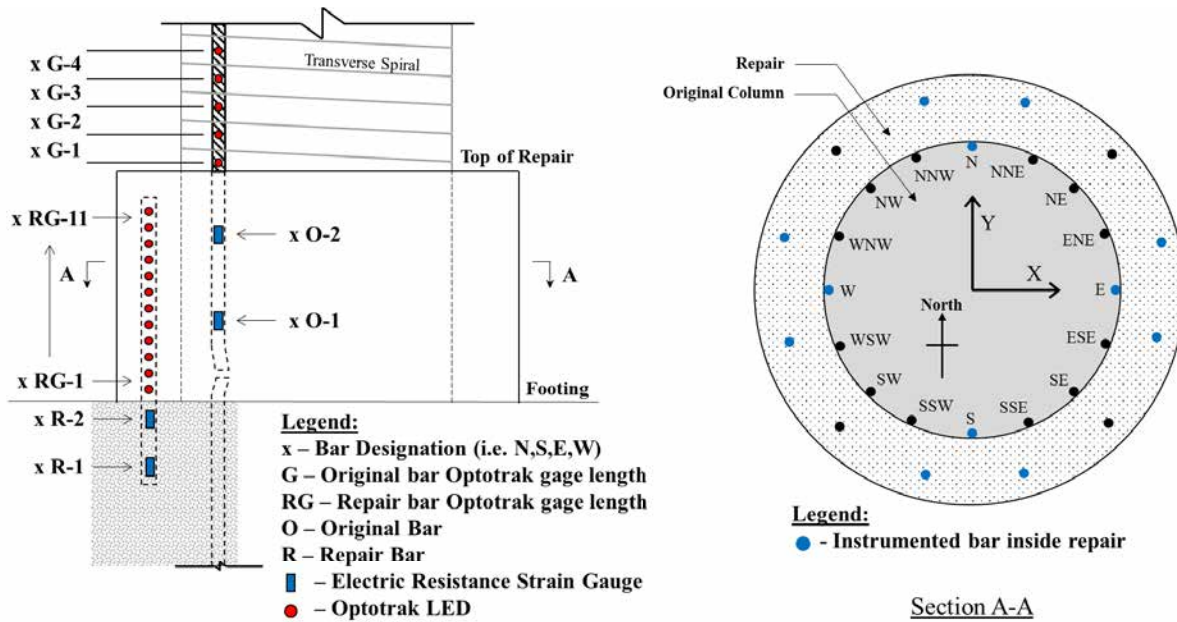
Repair #4 Instrumentation labels and repair cross section layout.
